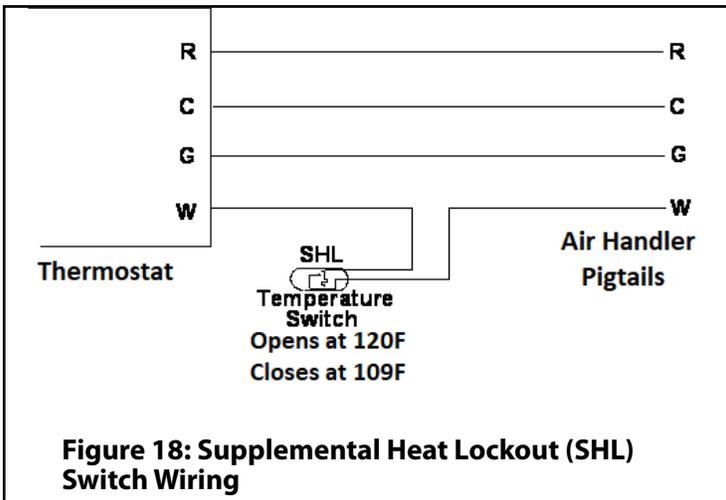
Supplemental Heat Lockout (SHL) Switch Wiring
